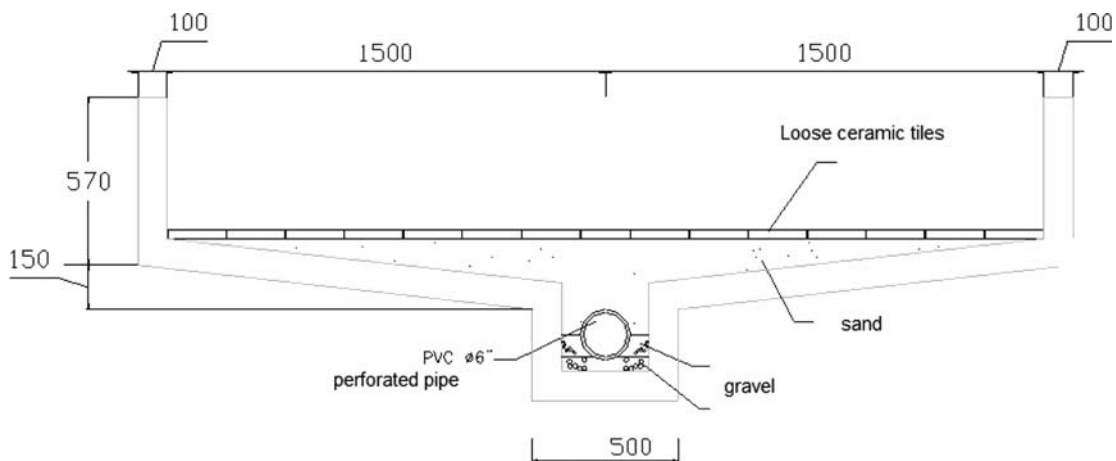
Cross section of a typical drying bed (Source: Orozco, 2005)
